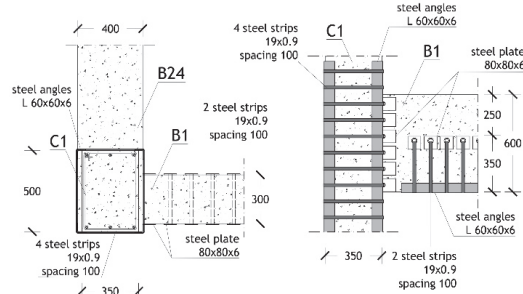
ACM-strengthened ground storey beam-to-column joint B.
